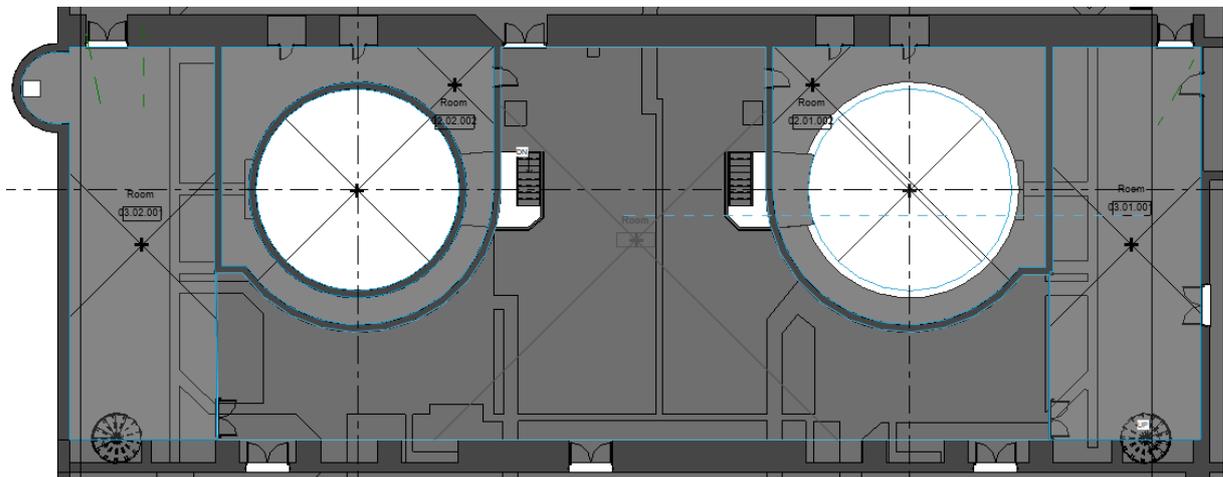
Inserting rooms on the architectural model, at elevation 196,00 using Revit.
